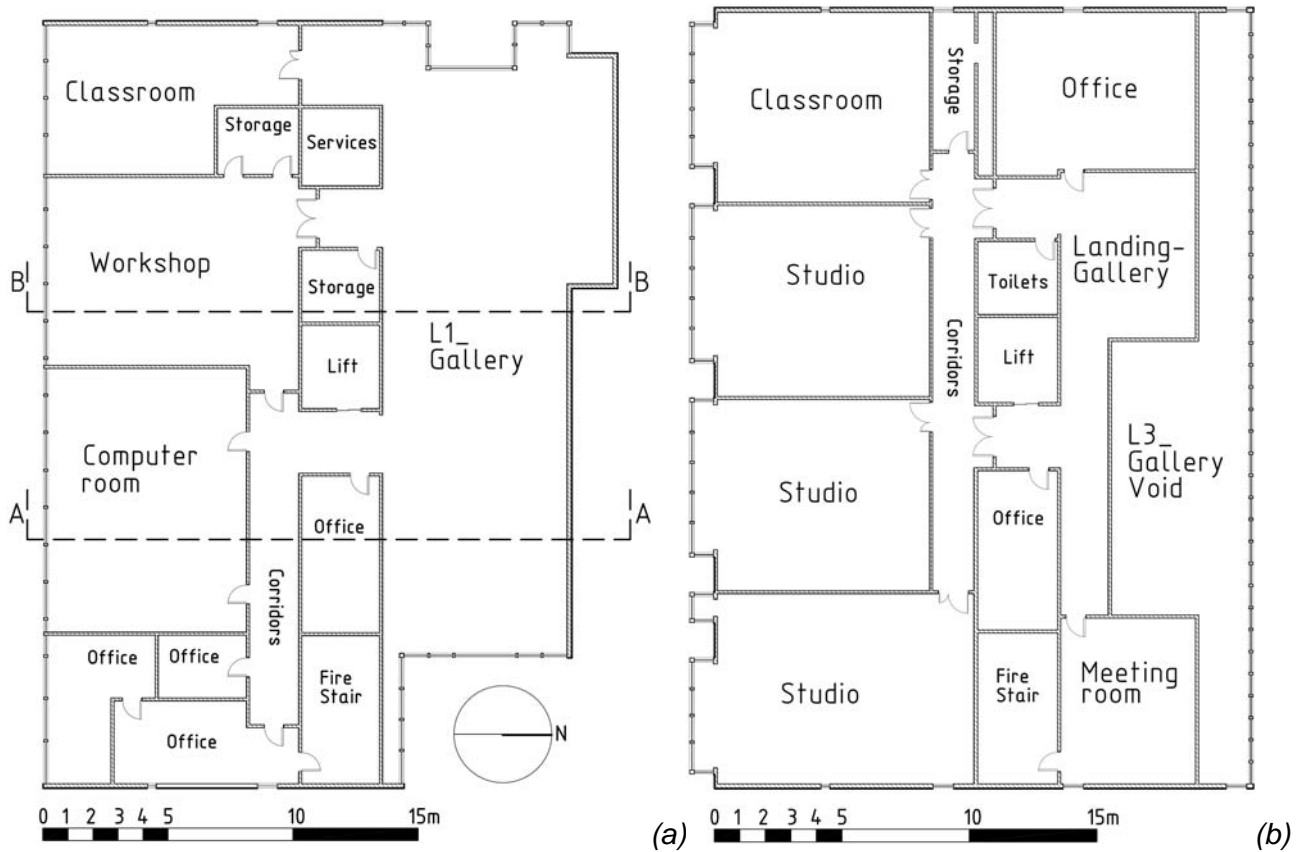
Plan views of the Arts building. (a) Level 1. (b) Level 3.
